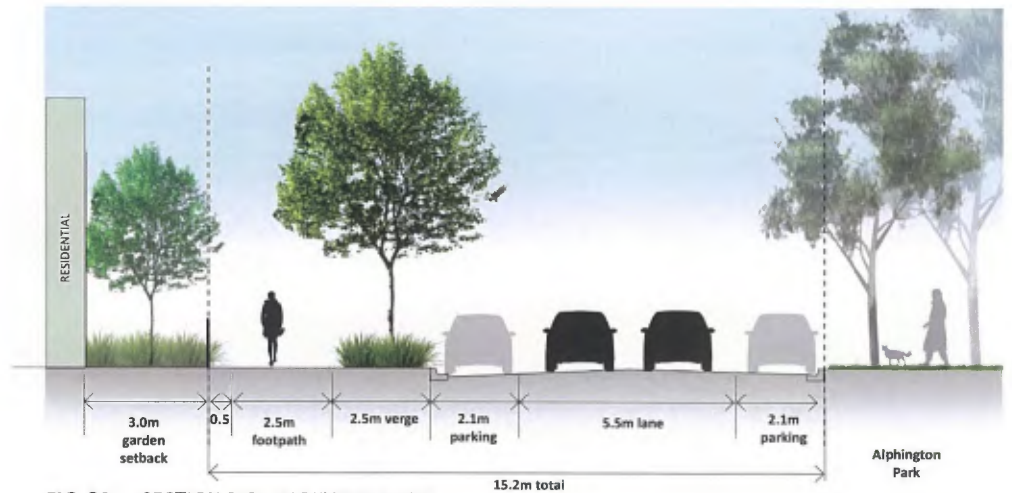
SECTION D-D - PARKVIEW DRIVE
